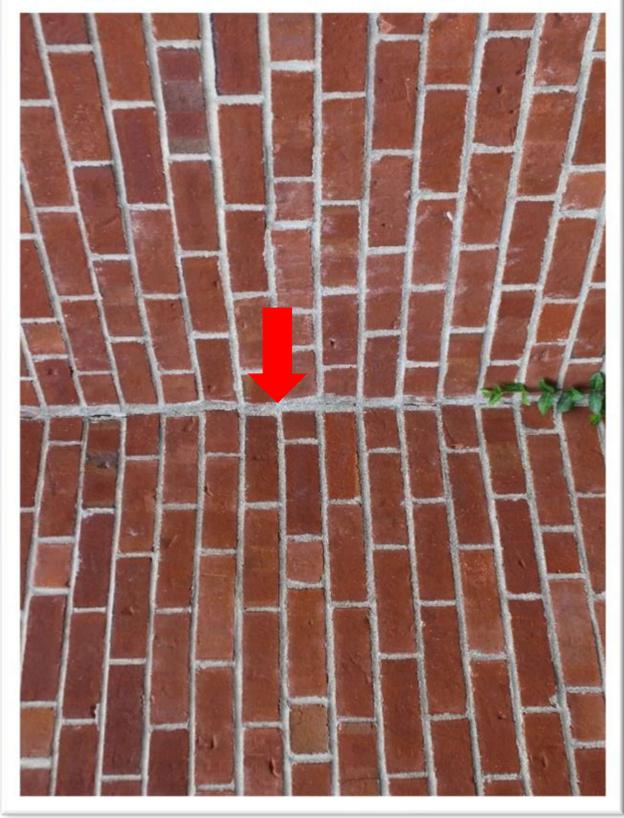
Photo shows one a several defective vertical brick mortar joints.
